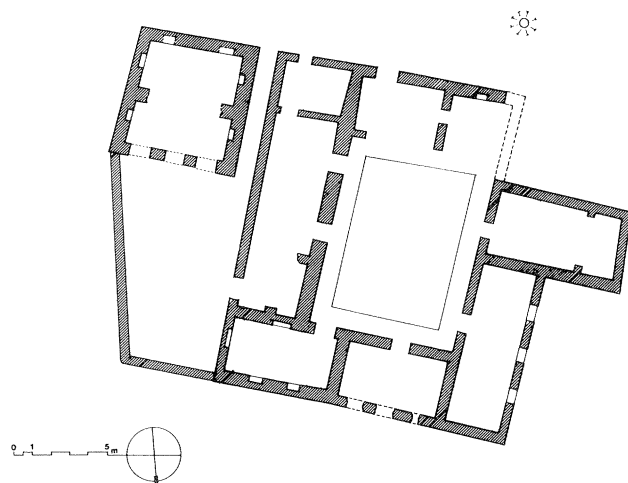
Masjid al-Luqta: plan of house and pavilion.
